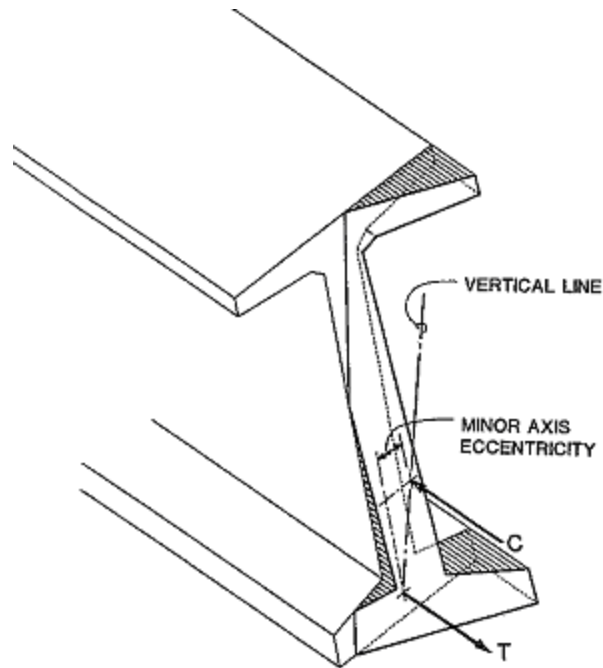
Midspan biaxial stress state in a prestressed concrete girder (Mast, 1993)
